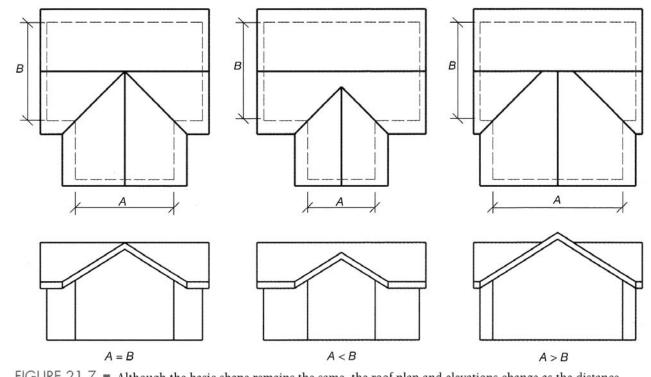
Although the basic shape remains the same, the roof plan and elevations change as the distance between walls varies.
